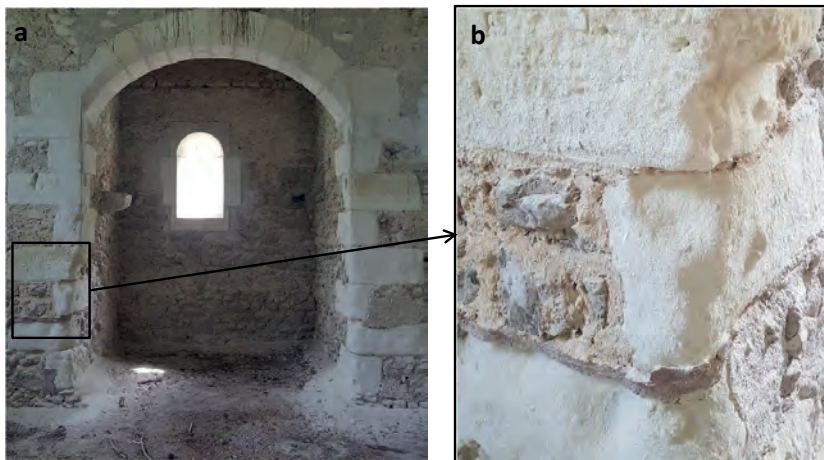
Interior corner quoin in tuffeau stonework supporting the arch (a) – detail of powdering (b).
